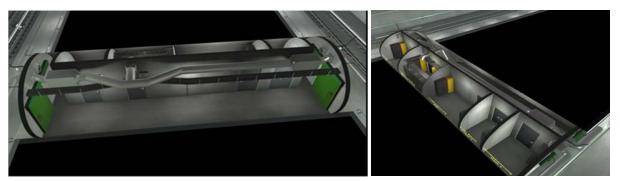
Principle layout of cross-passages in a modern twin-tube single track tunnel [14]
